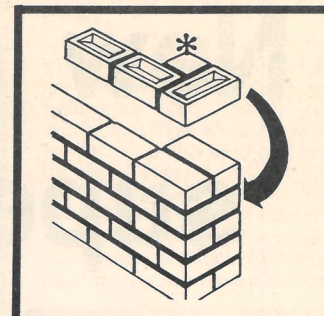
Strengthening pier at end of wall (asterisk denotes half-bat)
